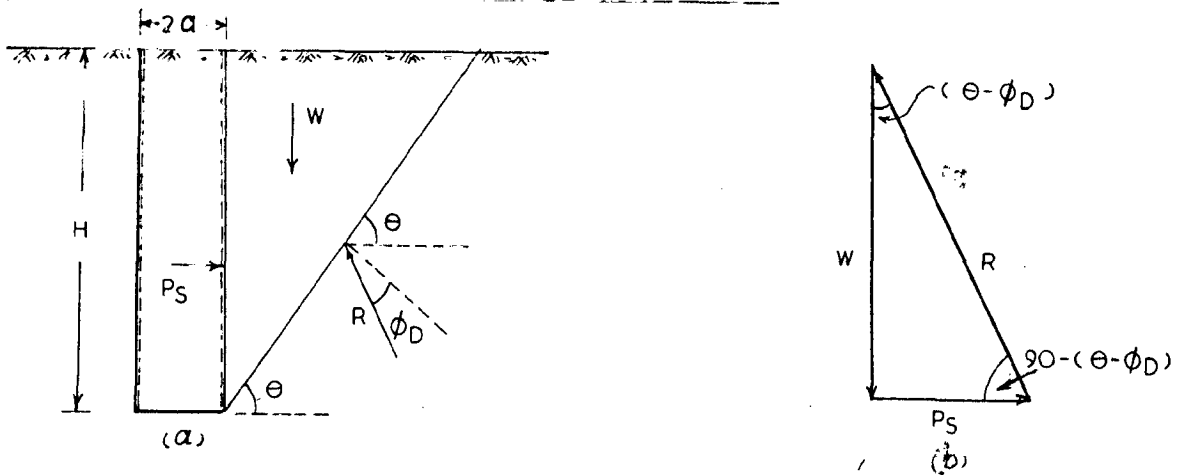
SLURRY TRENCH IN DRY COHESIONLESS SAND
